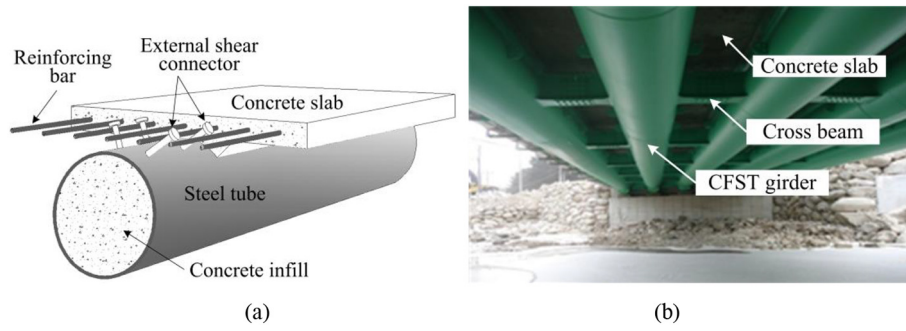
Typical CFST composite girder: (a) Schematic view of CFST composite girder, and (b) Construction example.
